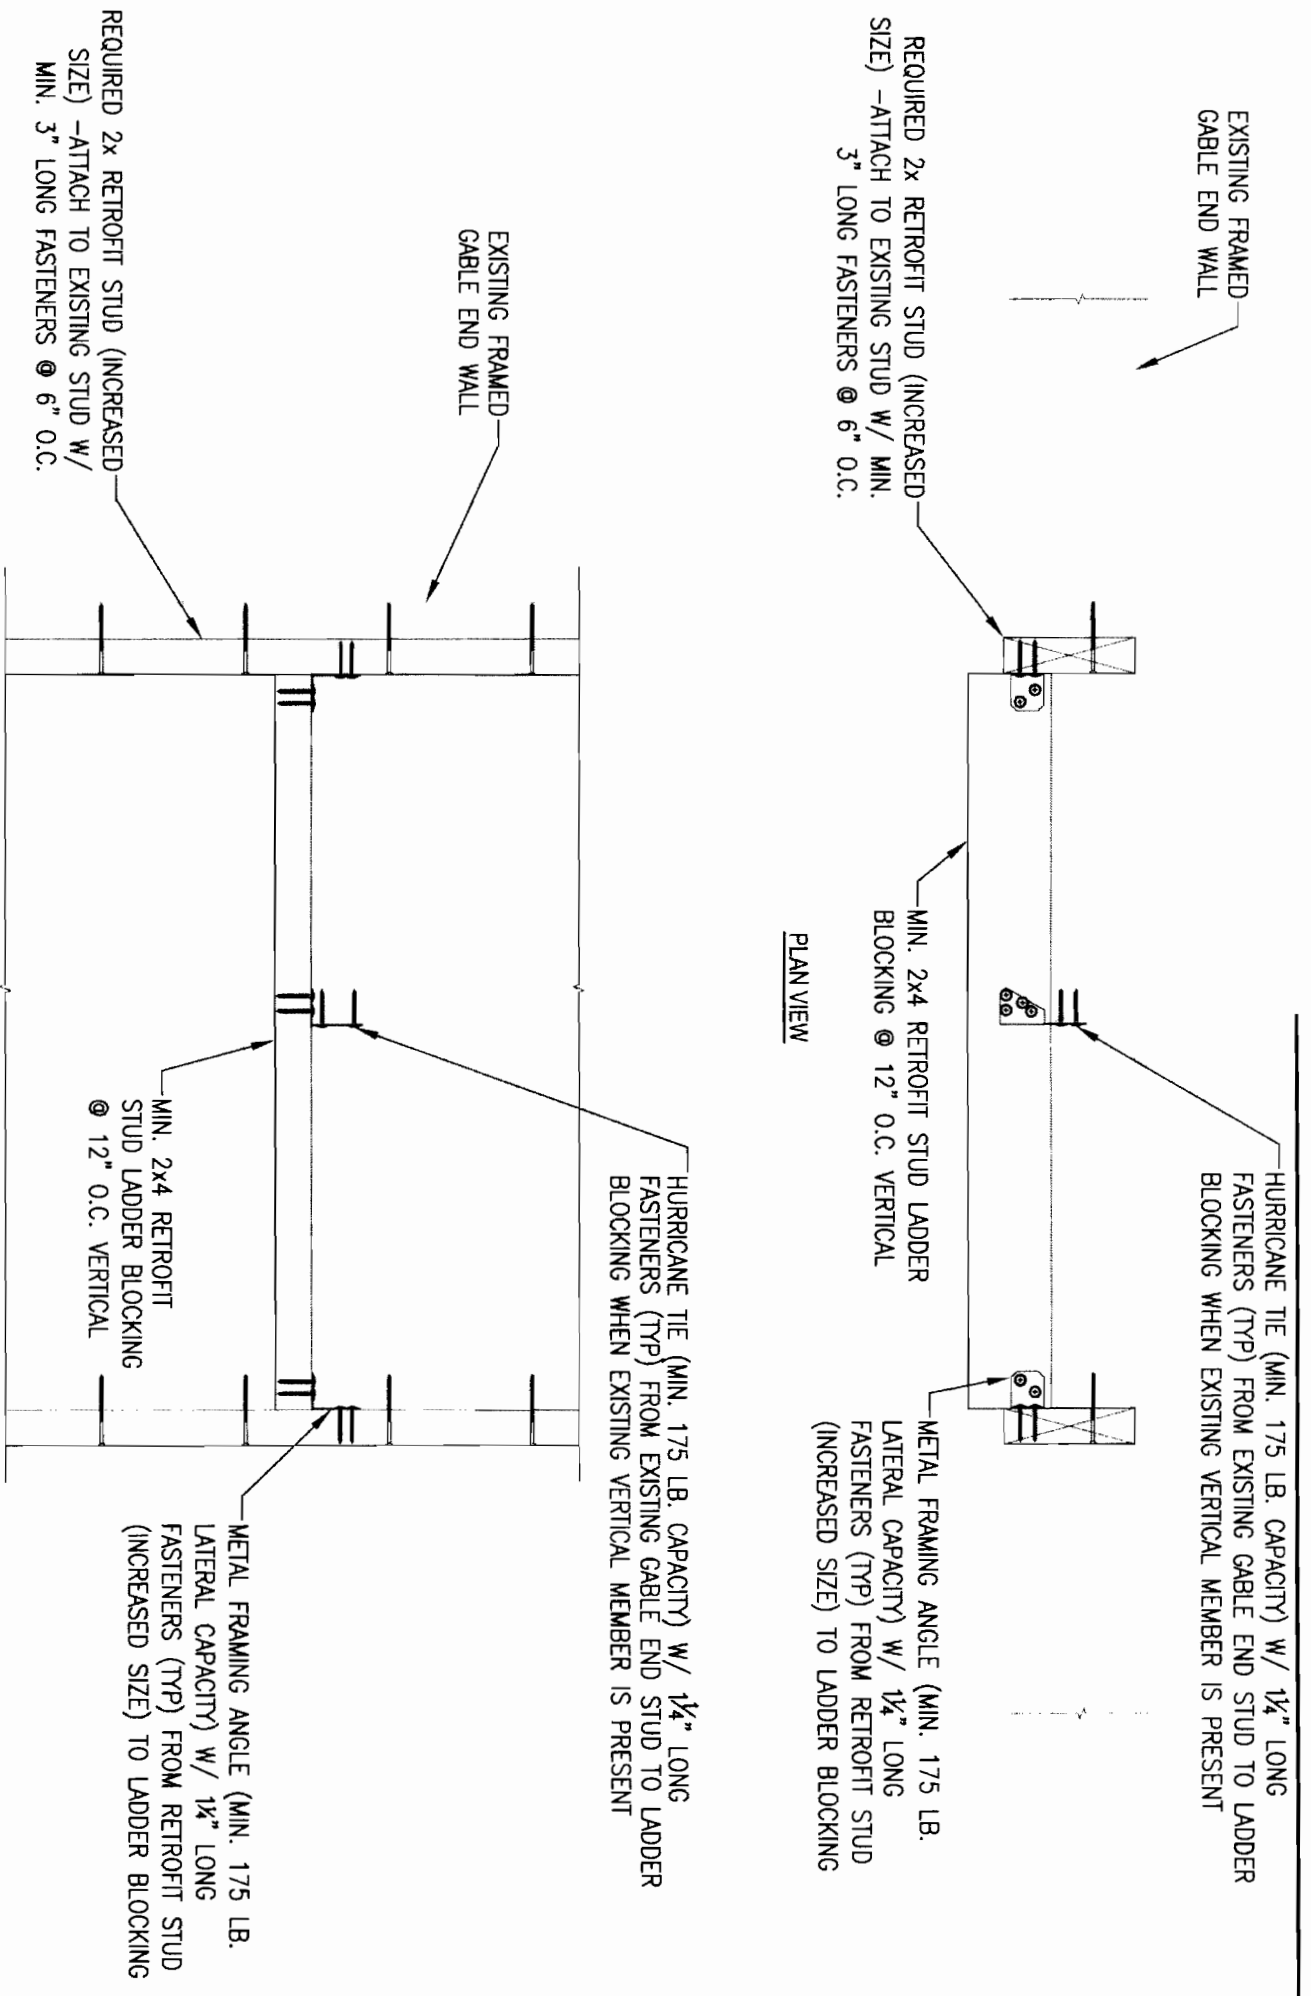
DETAIL OF LADDER BRACING FOR OMITTED RETROFIT STUD (CONVENTIONAL FRAMING)
